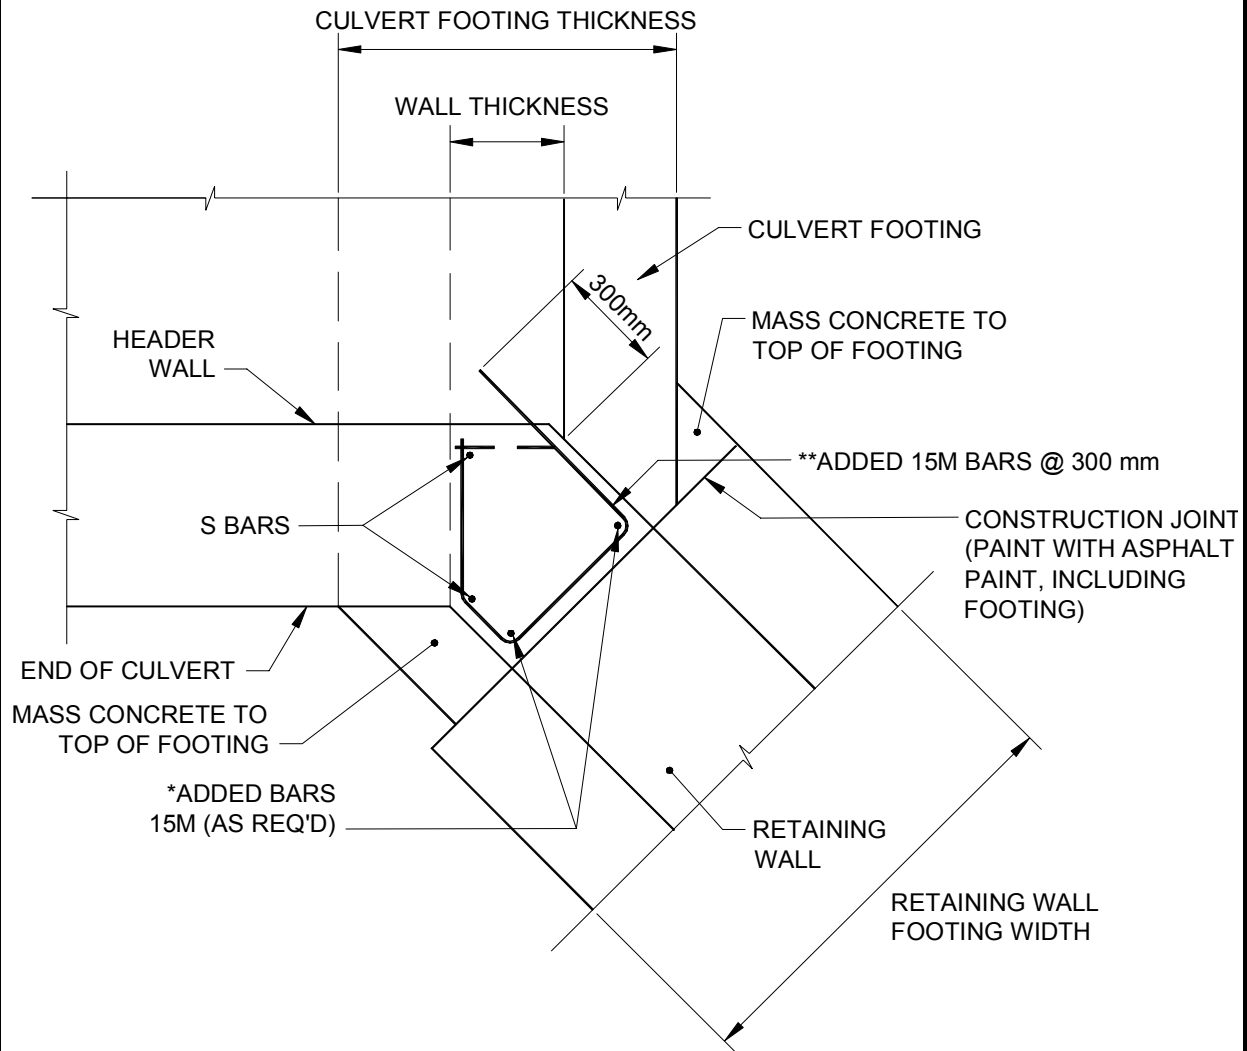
(a) RETAINING WALLS PERPENDICULAR TO LONGITUDINAL AXIS (open footing culverts)
